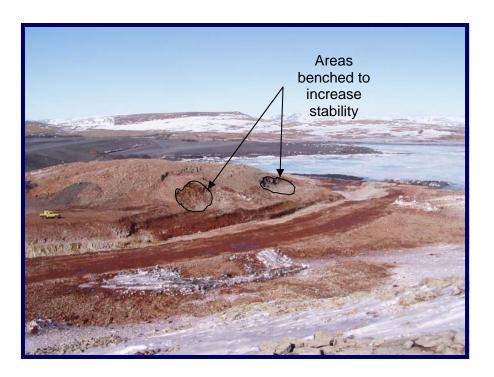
May 27, 2005 Dolostone outcrop after benching.
